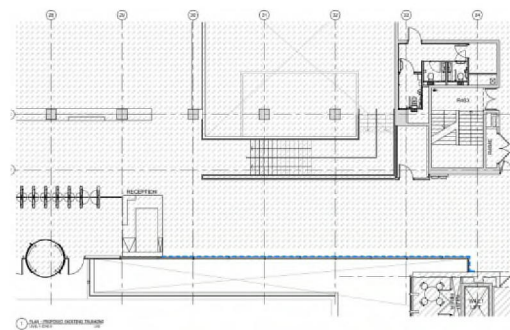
Plan showing location of trunking (Extract from drawing ref. 3147-P7-2406)
